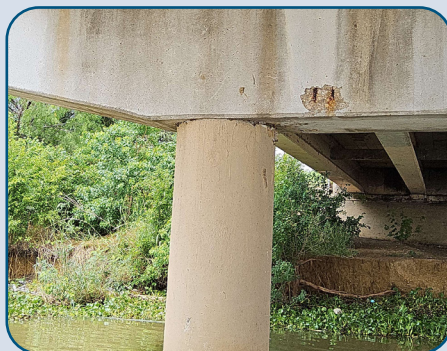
MCLB Bent Cap Spalling with Exposed Reinforcement.
